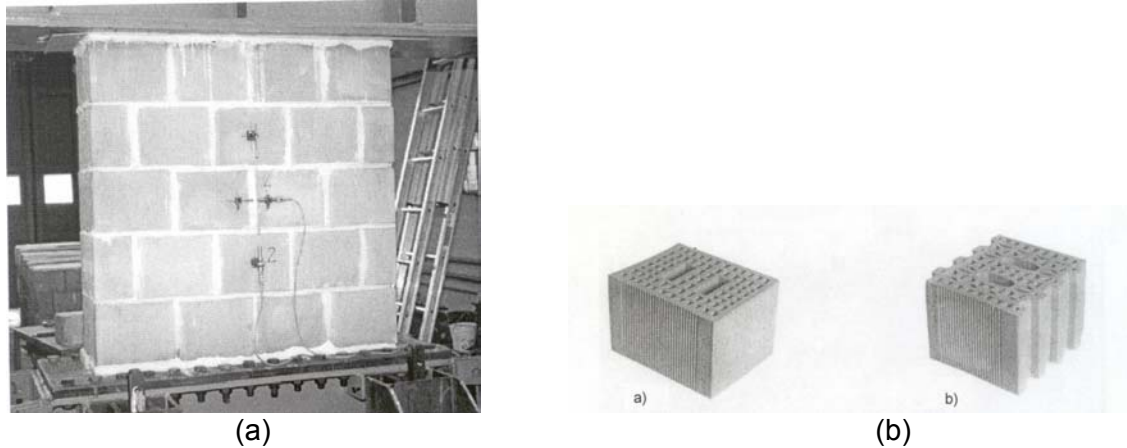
(a) Typical experimental wall and (b) perforated clay blocks.
